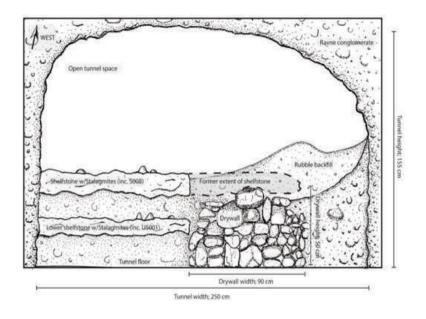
The first drywall (drywall 1) discovered in the Ravne 3 tunnels during 2019 (drawing made by R. Hoyle, 2020)
